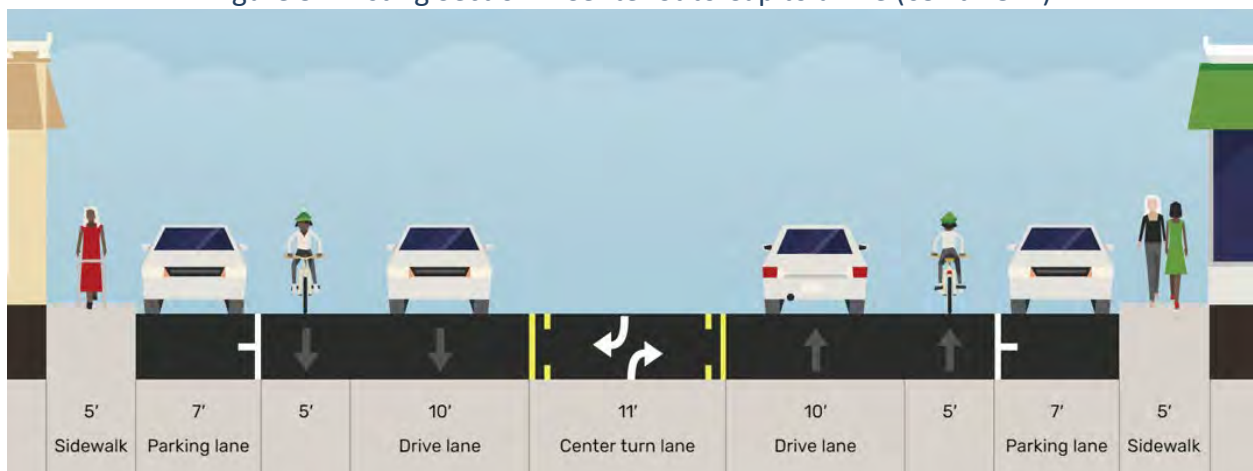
Existing Section – Capitola Ave to Burlingame Ave (56-ft ROW)
